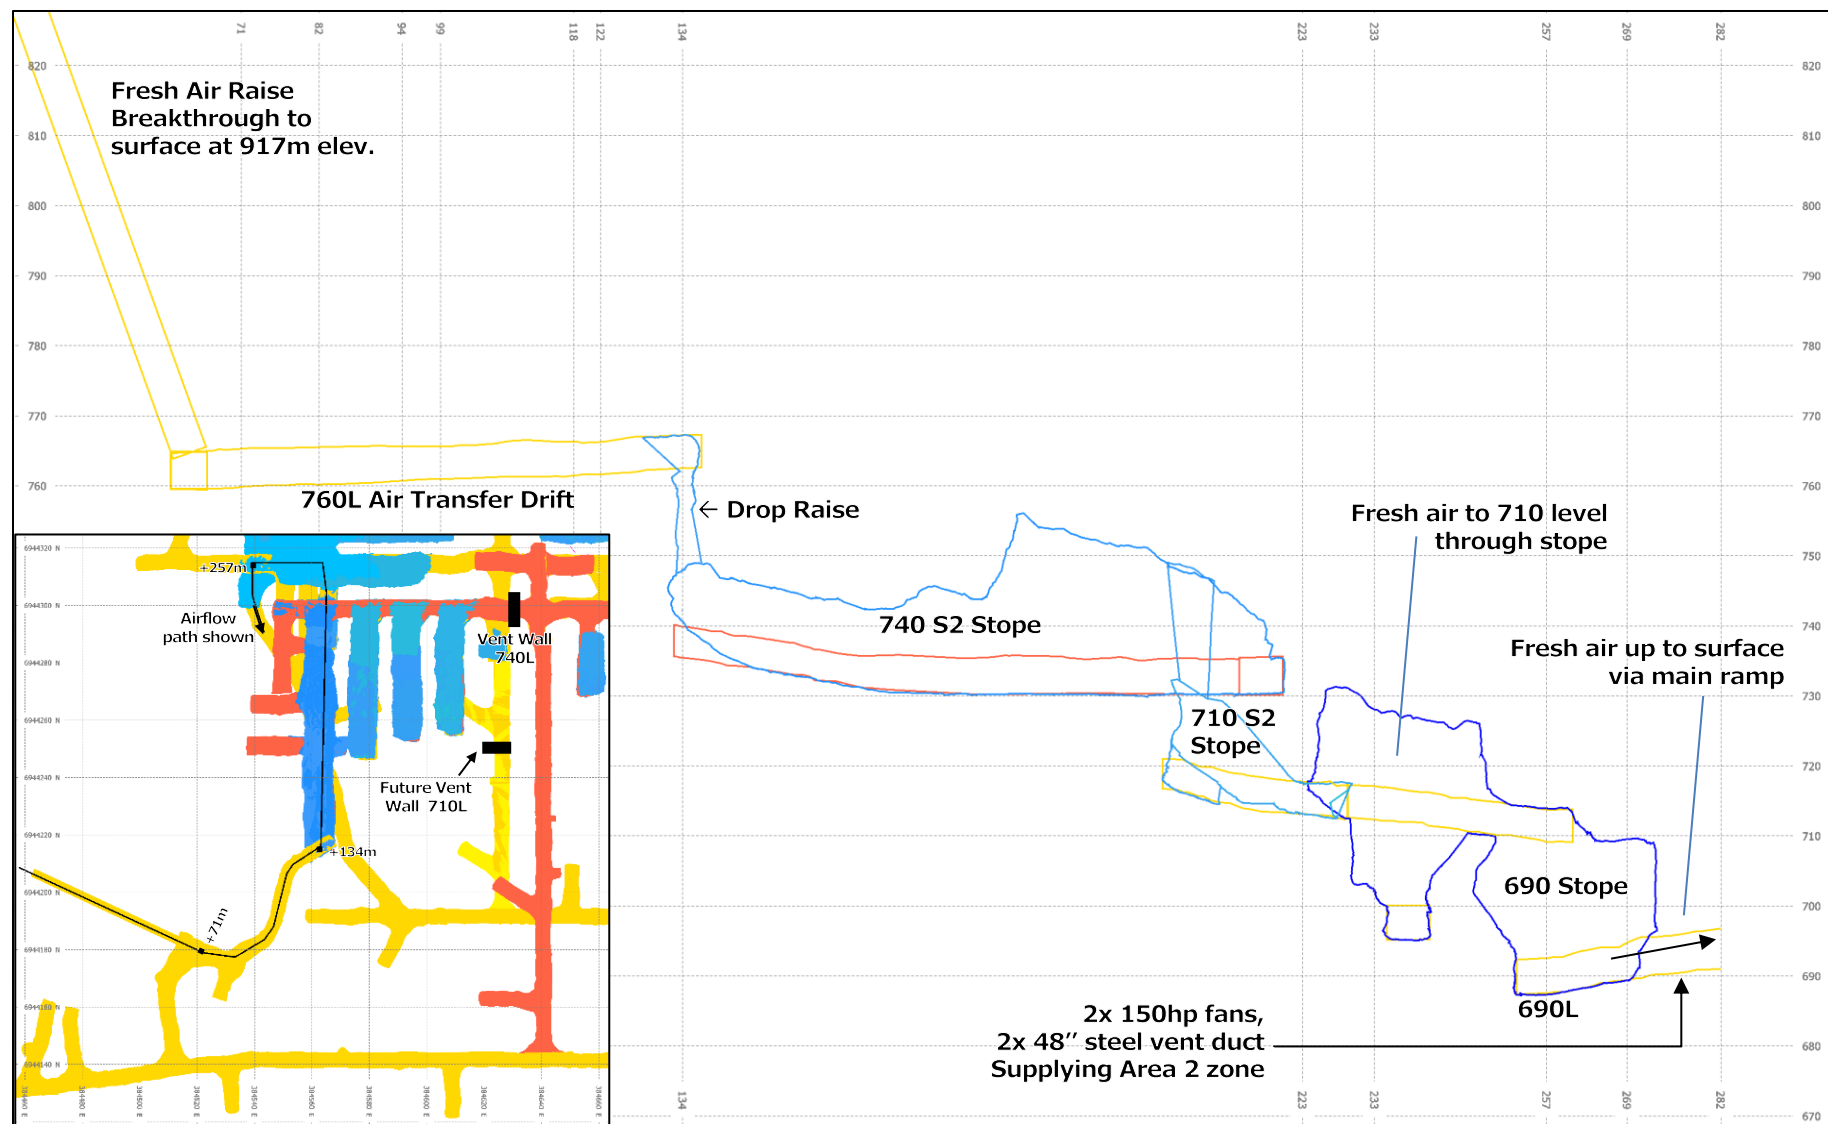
Cross-section through fresh air supply path to Minto South Underground.
